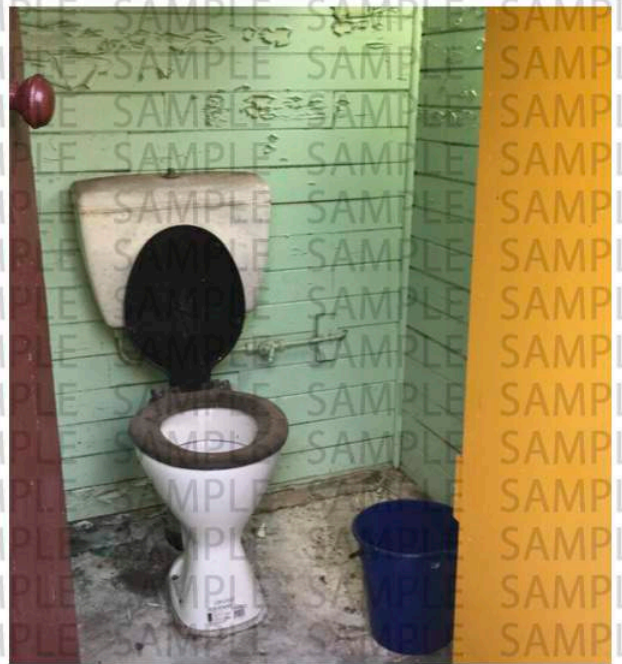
Rear WC installed in outbuilding. Asbestos containing materials.
